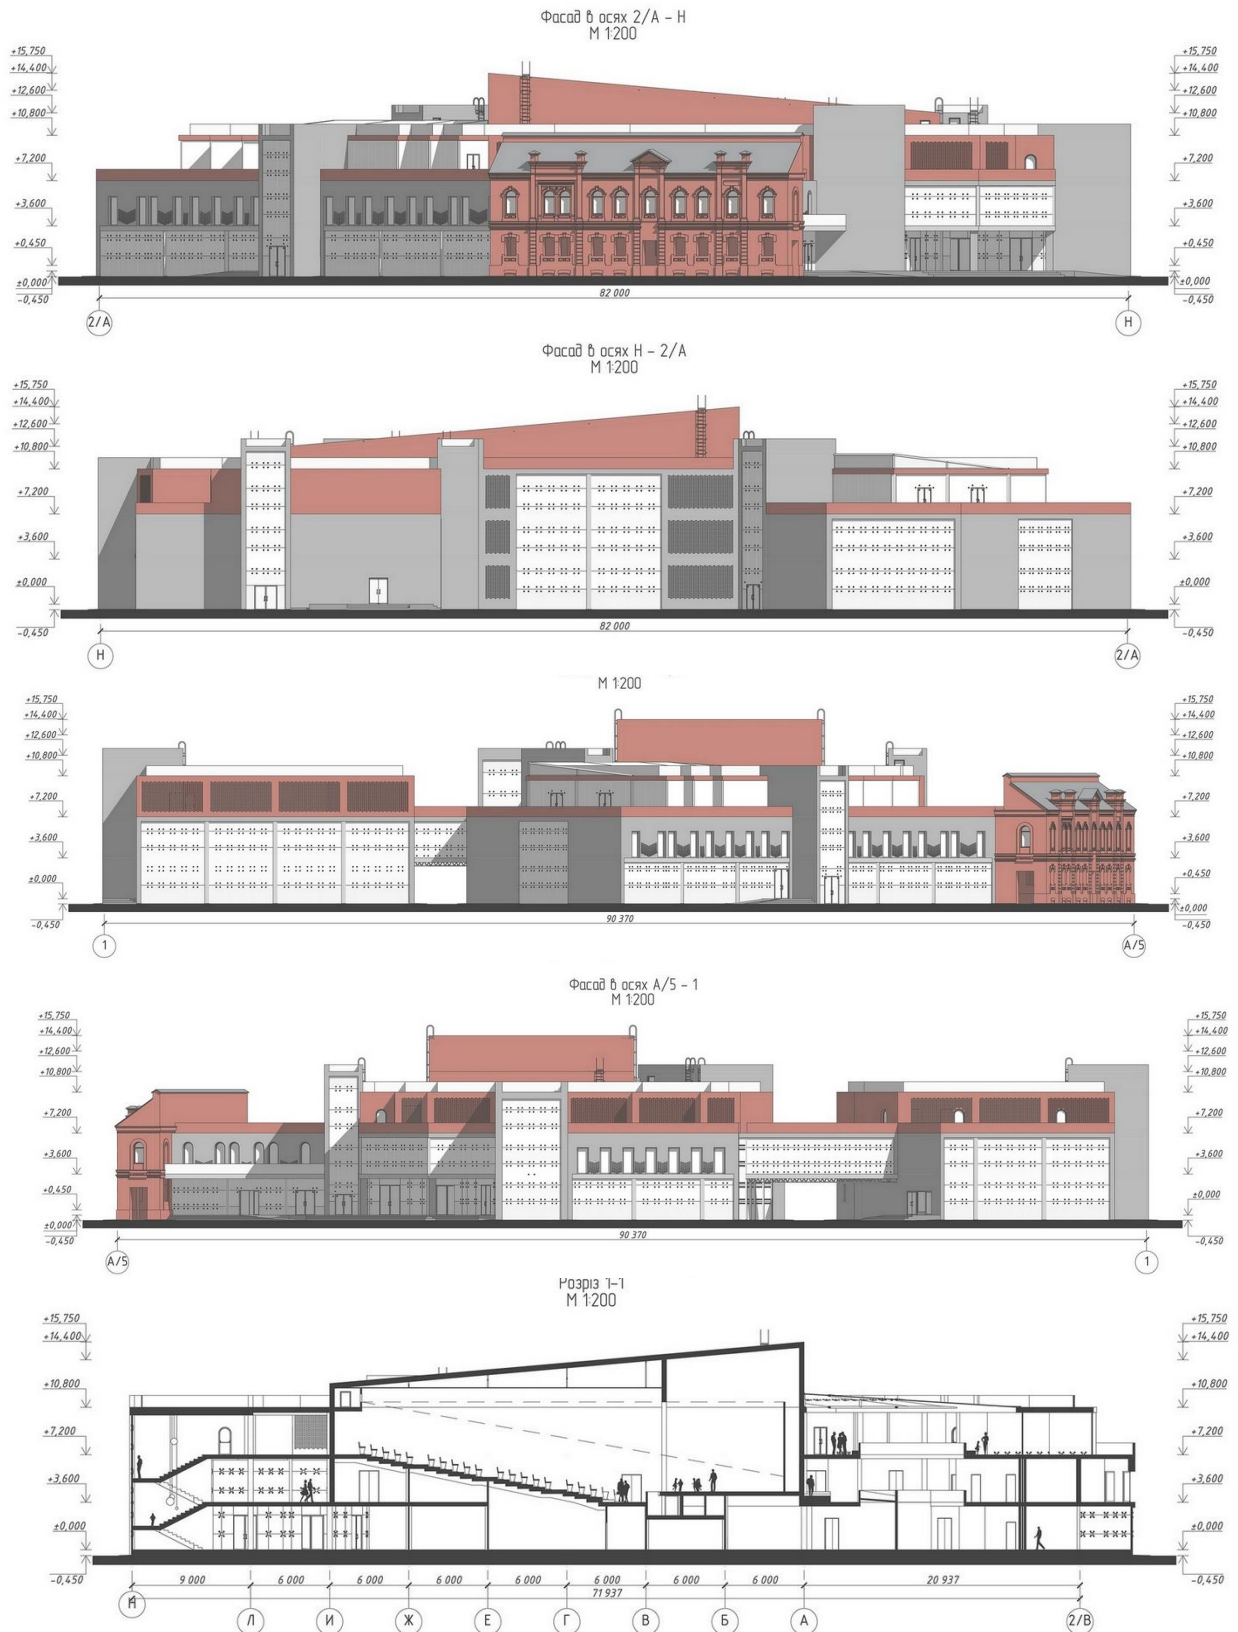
Facades and a section of a cultural and entertainment facility (example)
